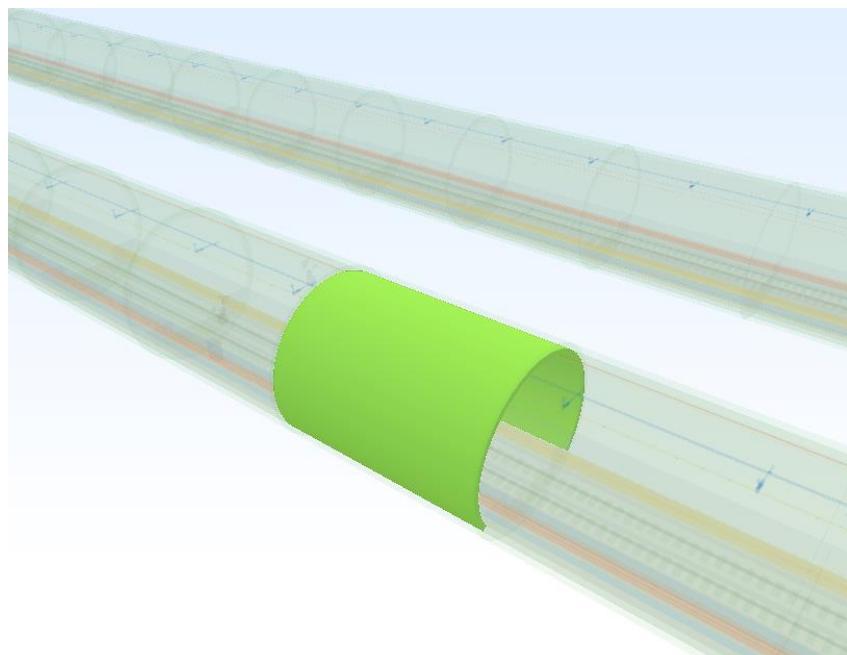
Typical block layout in a tunnel (Source: SBB/ILF).
